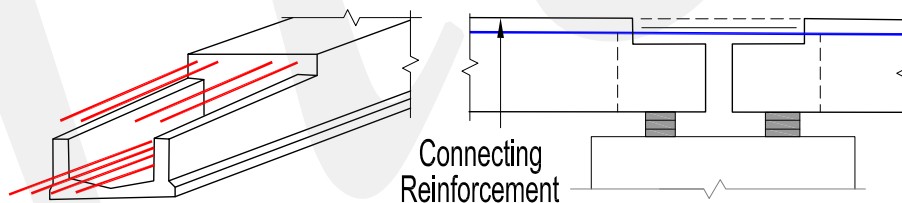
Continuity reinforcement in the diaphragm over the pier.
